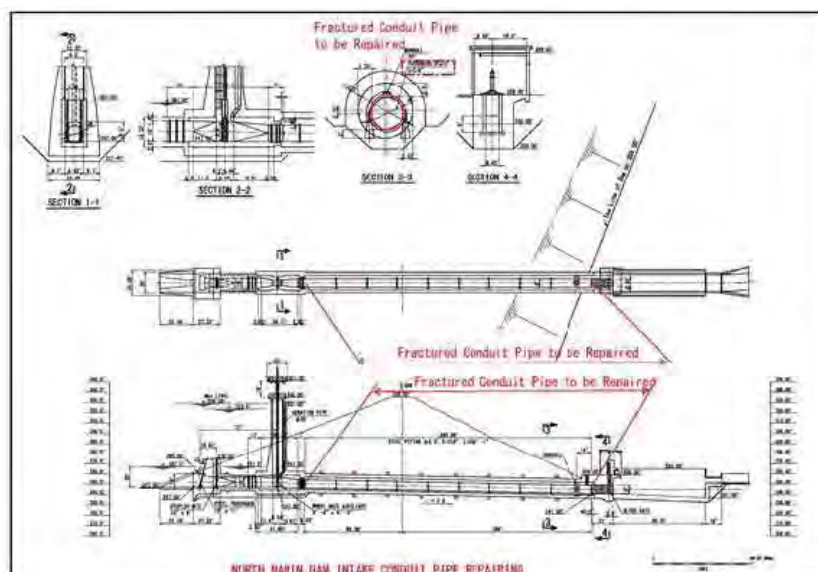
Damaged portion of Conduit Outlet Pipe of the North Nawin Intake
